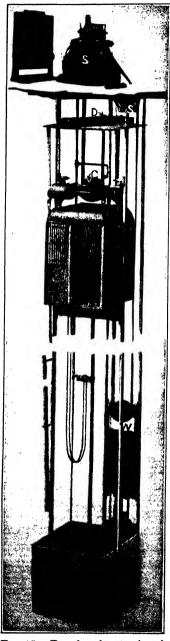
Traction-elevator installation with 2-to-1 roping.
